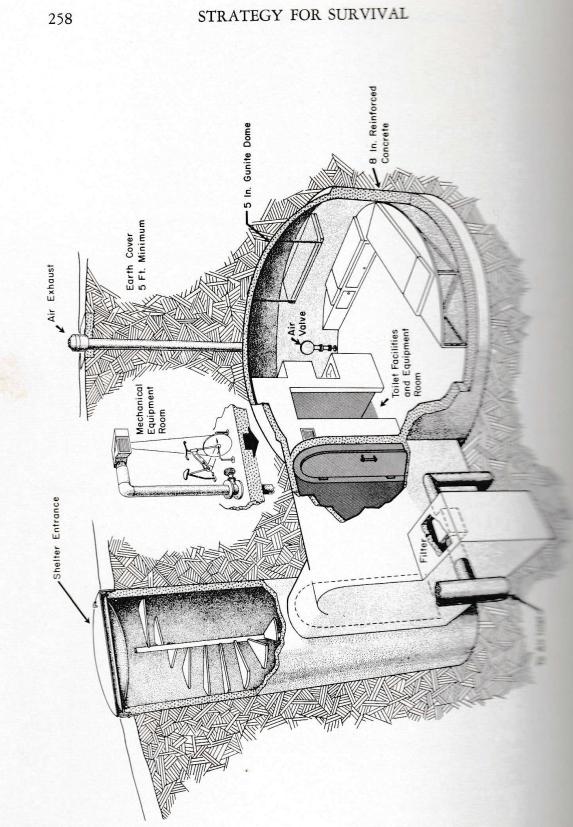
Eliptical dome reinforced concrete protective formers shelter.
